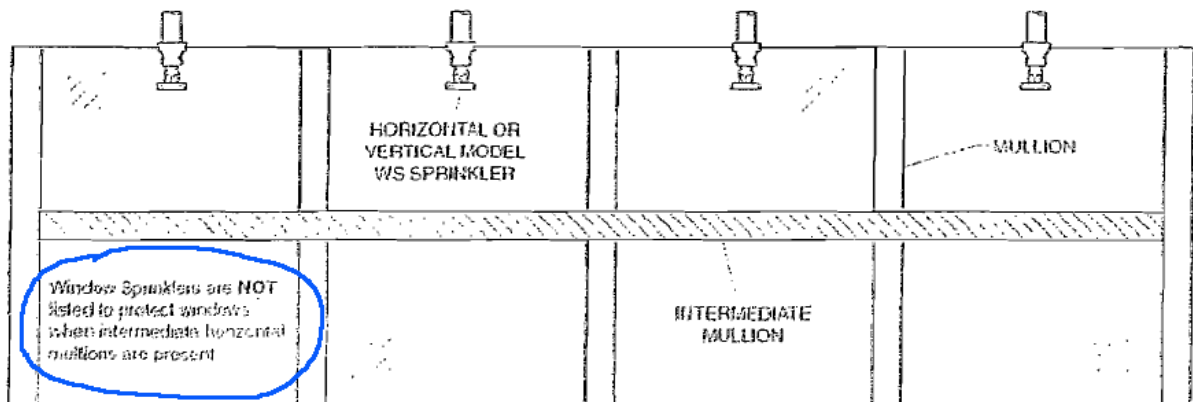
B-3 — WINDOWS WITH HORIZONTAL MULLIONS
